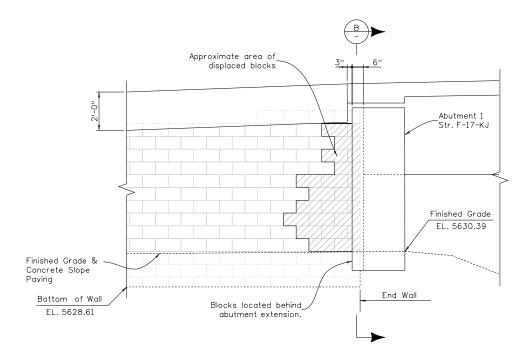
(J)-1 Sample Elevation of Area to be repaired on a MSE Wall
